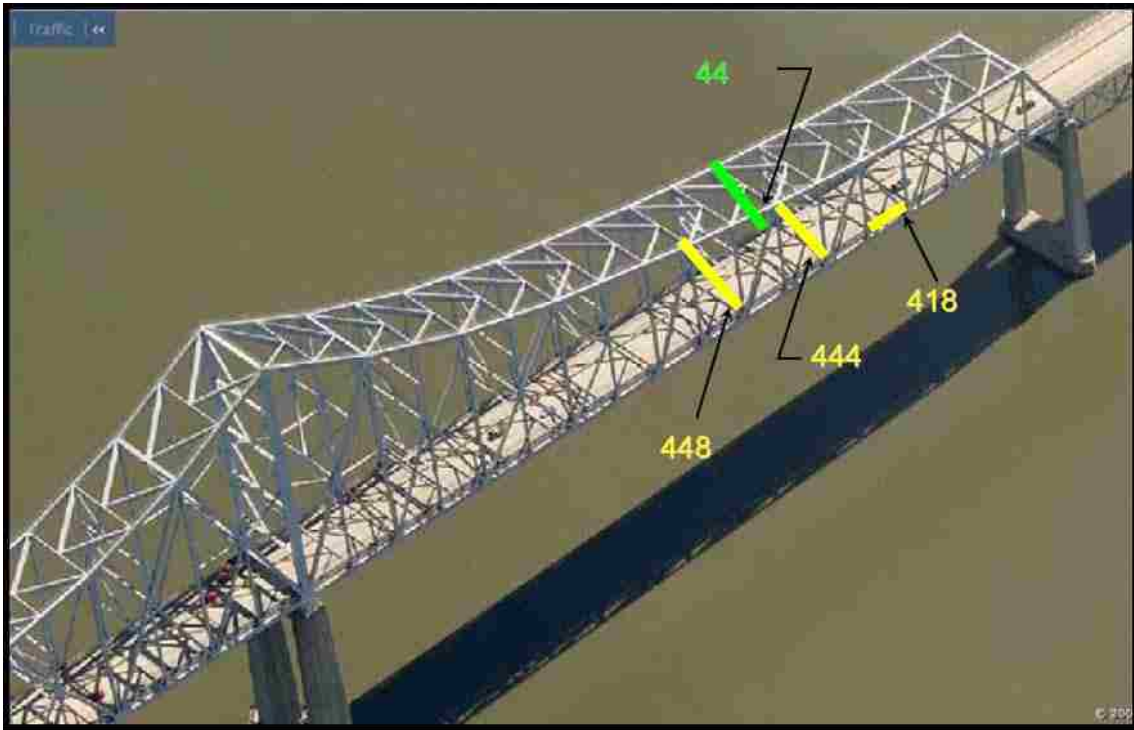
Photographic view of New Jersey back span looking upstream showing instrumented truss members (green = upstream; yellow = downstream) (From Hodgson et. al, 2008)
